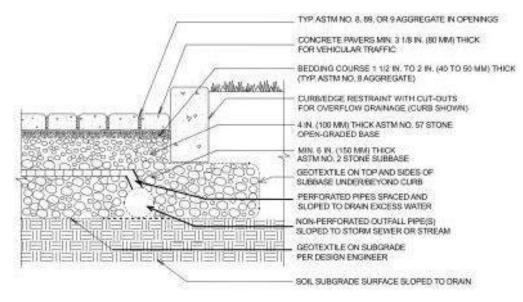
Underdrain Installation in Pervious Pavement.
